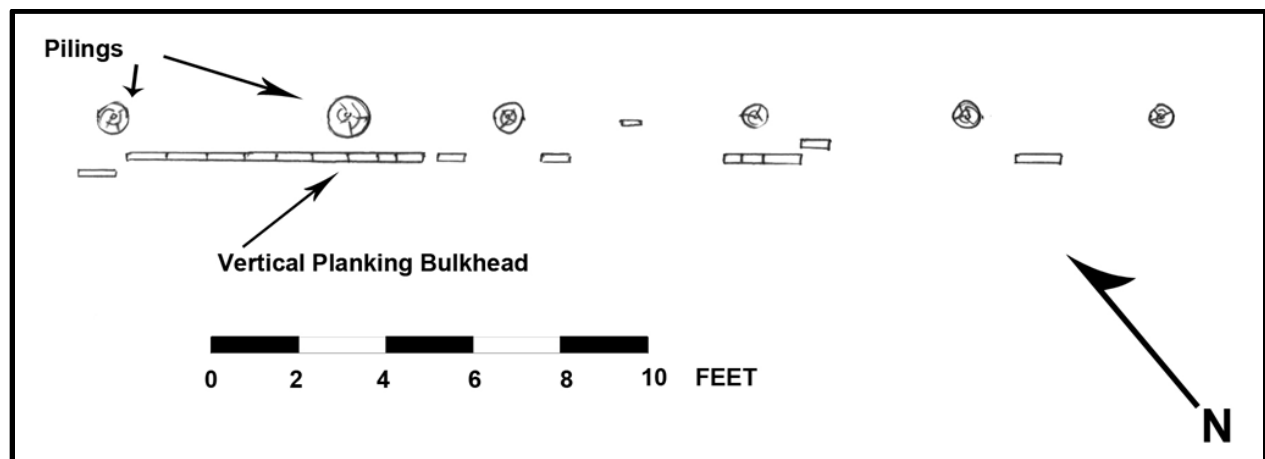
Plan drawing of A73 Pier (Sarah L. Tichonuk, LCMM Collection).
